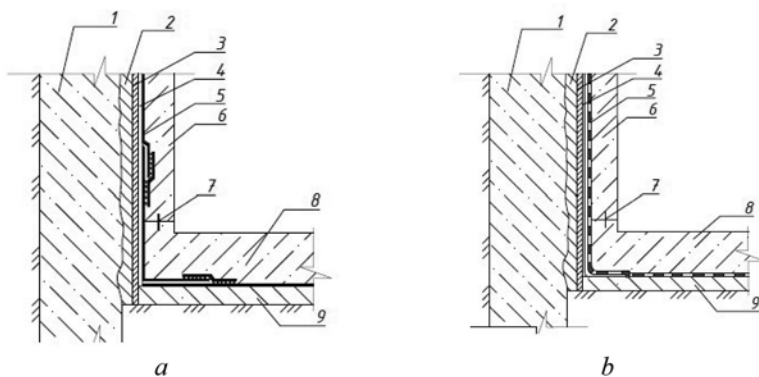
Waterproofing of structures without backfill cavities: a – using factory-made membranes; b – using sheet waterproofing with a surface layer of sprayed compositions with two-sided adhesion; 1 – enclosing ‘diaphragm wall’; 2 – levelling layer of fine-grained concrete or false wall; 3 – layer of geotextile fabric, polyester foam boards or profiled membranes; 4 – slip plane; 5 – waterproofing coating; 6 – permanent wall; 7 – water stop; 8 – buckle plate; 9 – foundation mattress.
